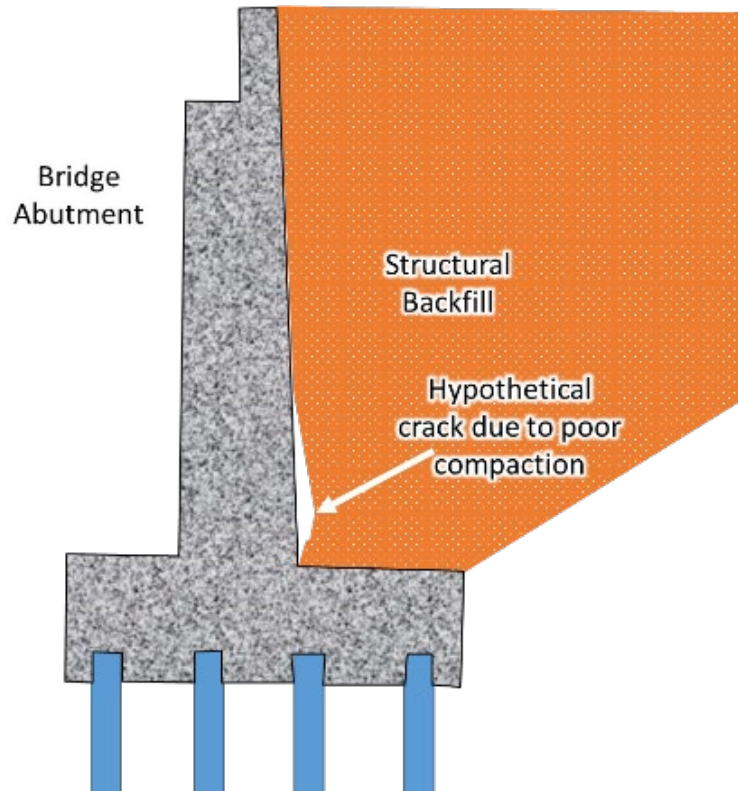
Section of bridge abutment showing hypothetical crack through structural backfill along face of bridge abutment.
